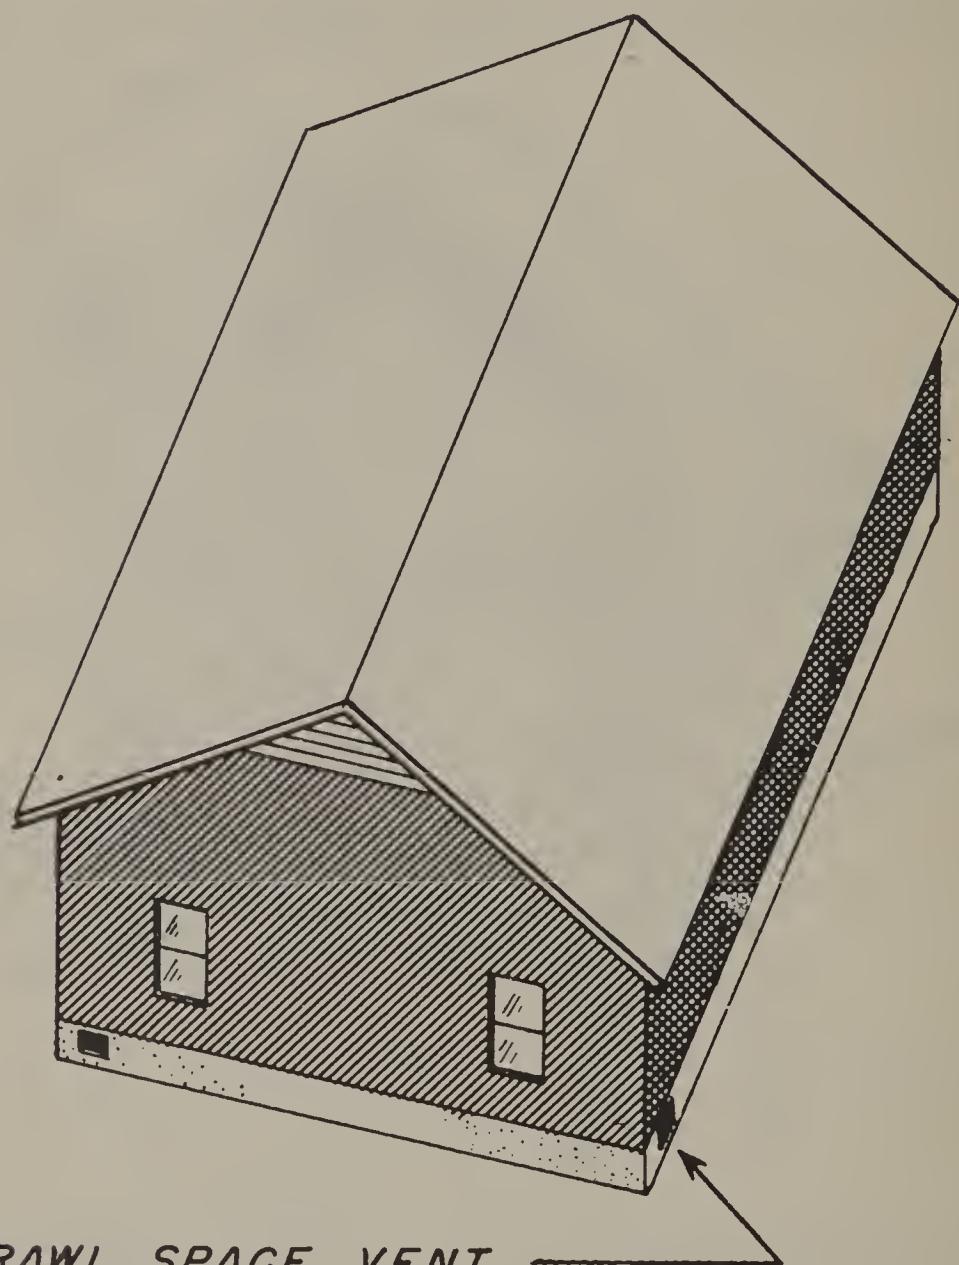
Attic and crawl-space ventilation, gable roof.* Louvers in the ends of gables, just below the ridge, are an effective means of condensation control in attics. These openings may be supplemented by continuous openings below the eaves, which in conjunction with gable louvers provide air circulation by gravity when air movement produced by wind is lacking. Large vent areas, louvers, and adequate thermal insulation in the ceiling will minimize heat losses in the winter and, in addition, provide cooler living quarters in the summer. For details of attic vents see figure 41 and for sizes see "Good practice recommendations." Vents for the crawl space are shown near the corners of the building near the top of the foundation wall. For details of crawl space vents see figures 12-16 and for sizes see "Good practice recommendations."
